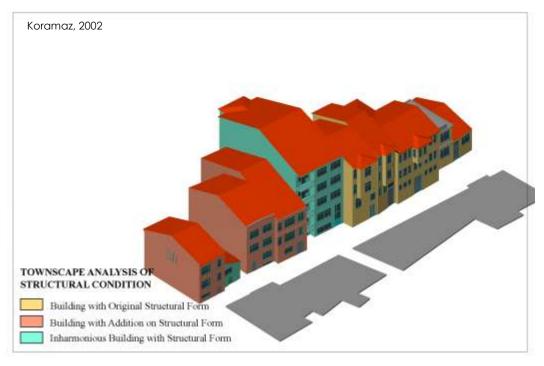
Townscape Analysis of Structural Form on Left Façade of Fazilet Street
